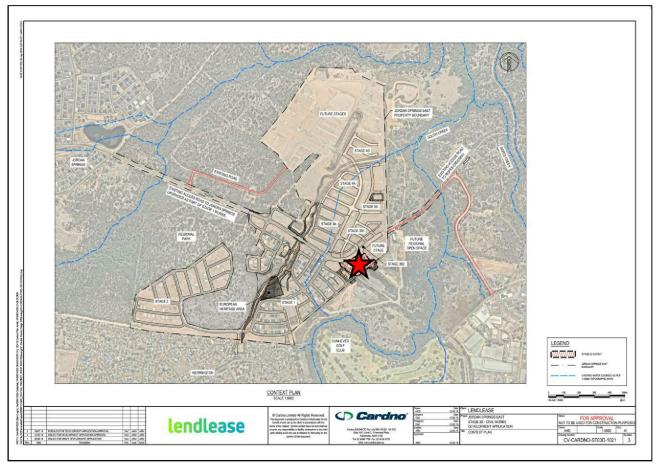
SITE CONTEXT – AERIAL PHOTO
